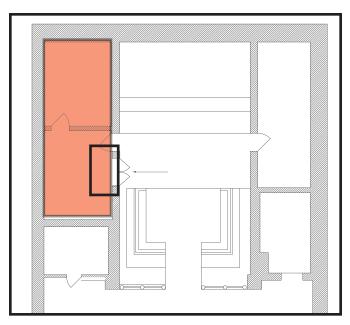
Floor plan of Sanctuary apse, showing organ rooms with new access door. Credit: Authors.
